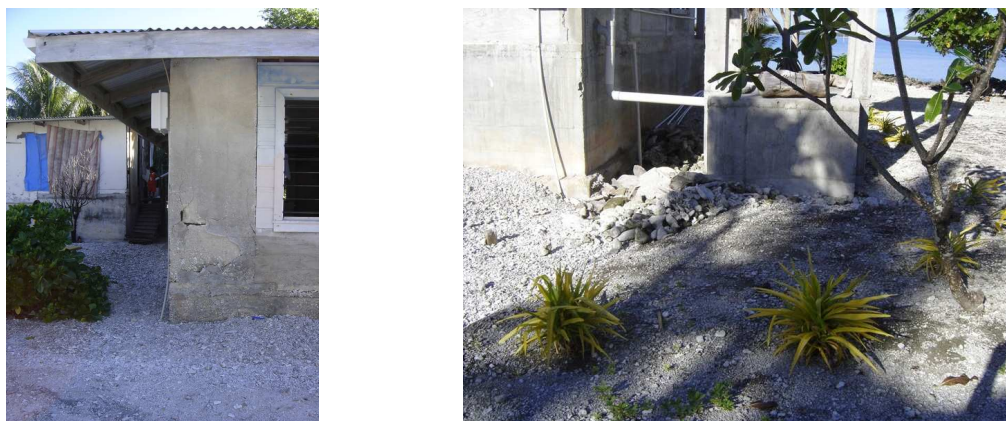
Damage to a building (left) likely due to debris impact, and scouring around the foundation (right) caused by overwashing water during Cyclone Percy. Both properties are located on low-lying land on the lagoon side on the promontory east of the school.
